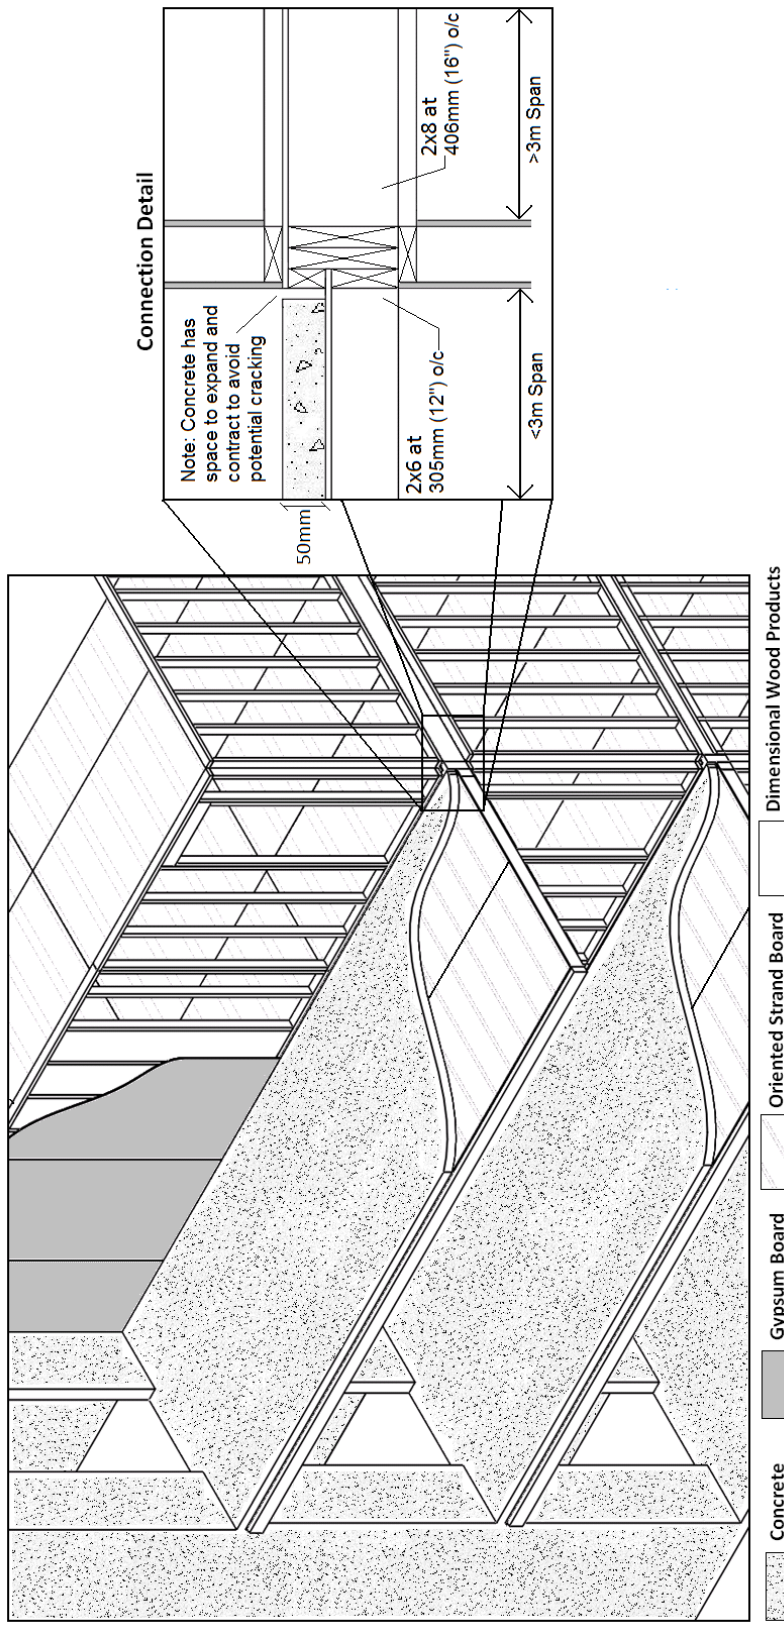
Section of a Feasible Light-frame Wood/concrete Mid-rise Structure
